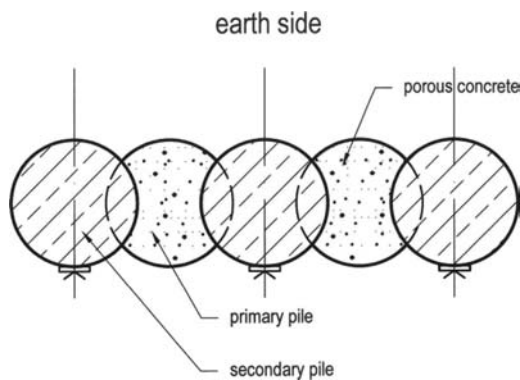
Secant bored pile wall with pervious primary pile and usual secondary pile.
